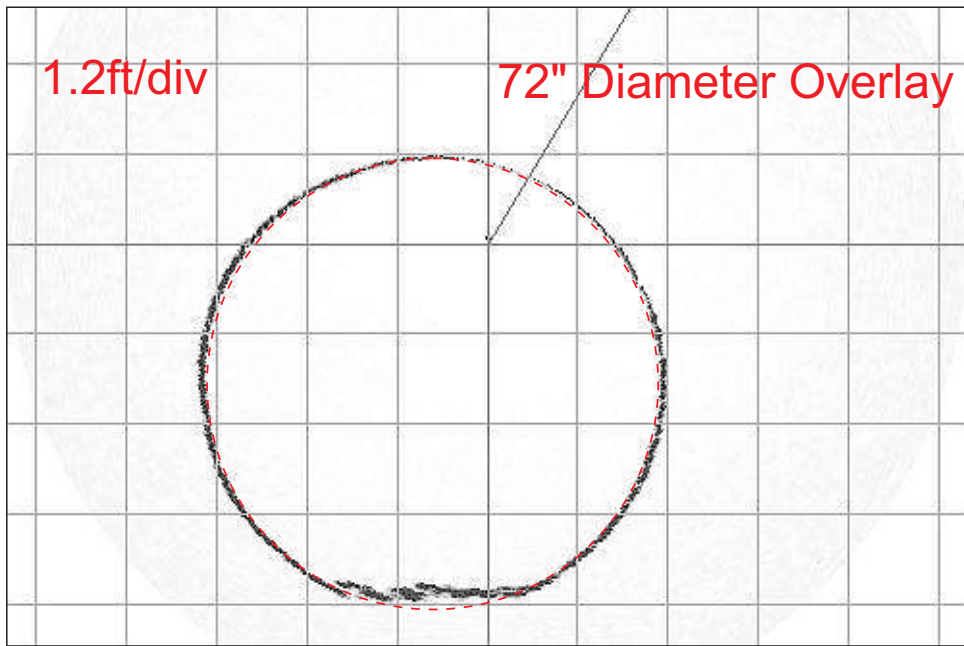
Sonar Profile 2 - 736 feet downstream of Access Point 1.
